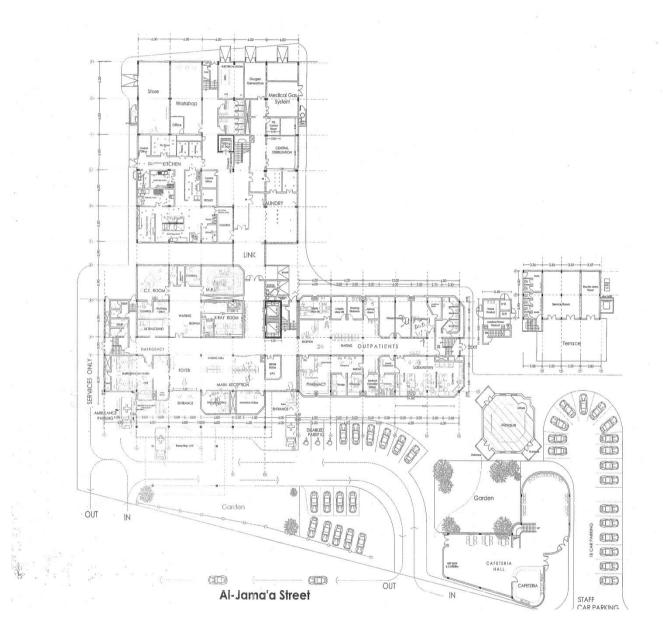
Al-moalem hospital's ground floor plan Source: (Al-moalem medical city administration)
